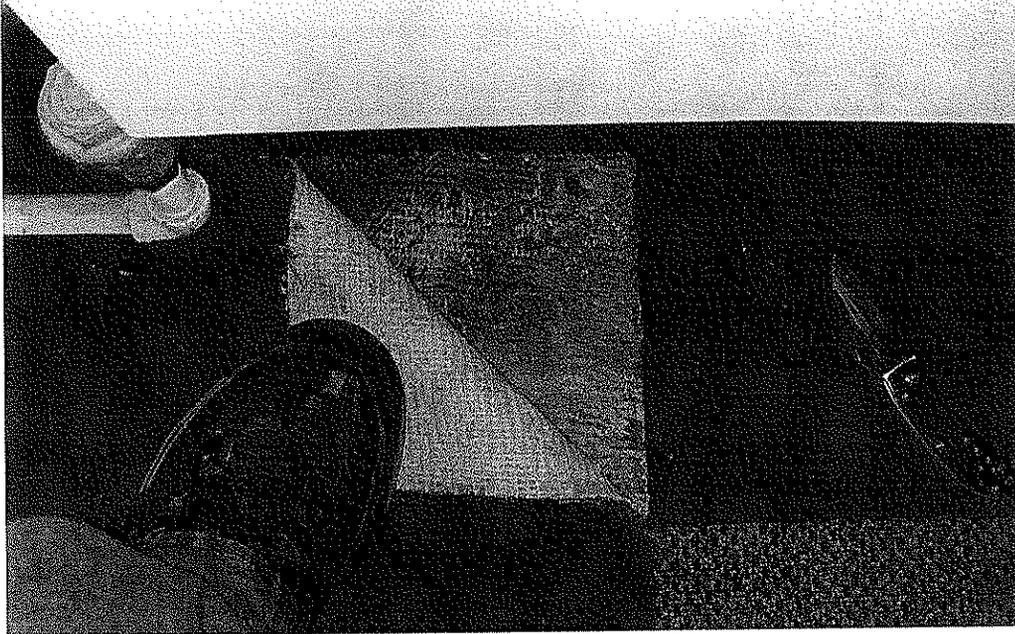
Asbestos containing sheet vinyl flooring, floor tile and mastic underneath the carpet shown in this photo are typical.
